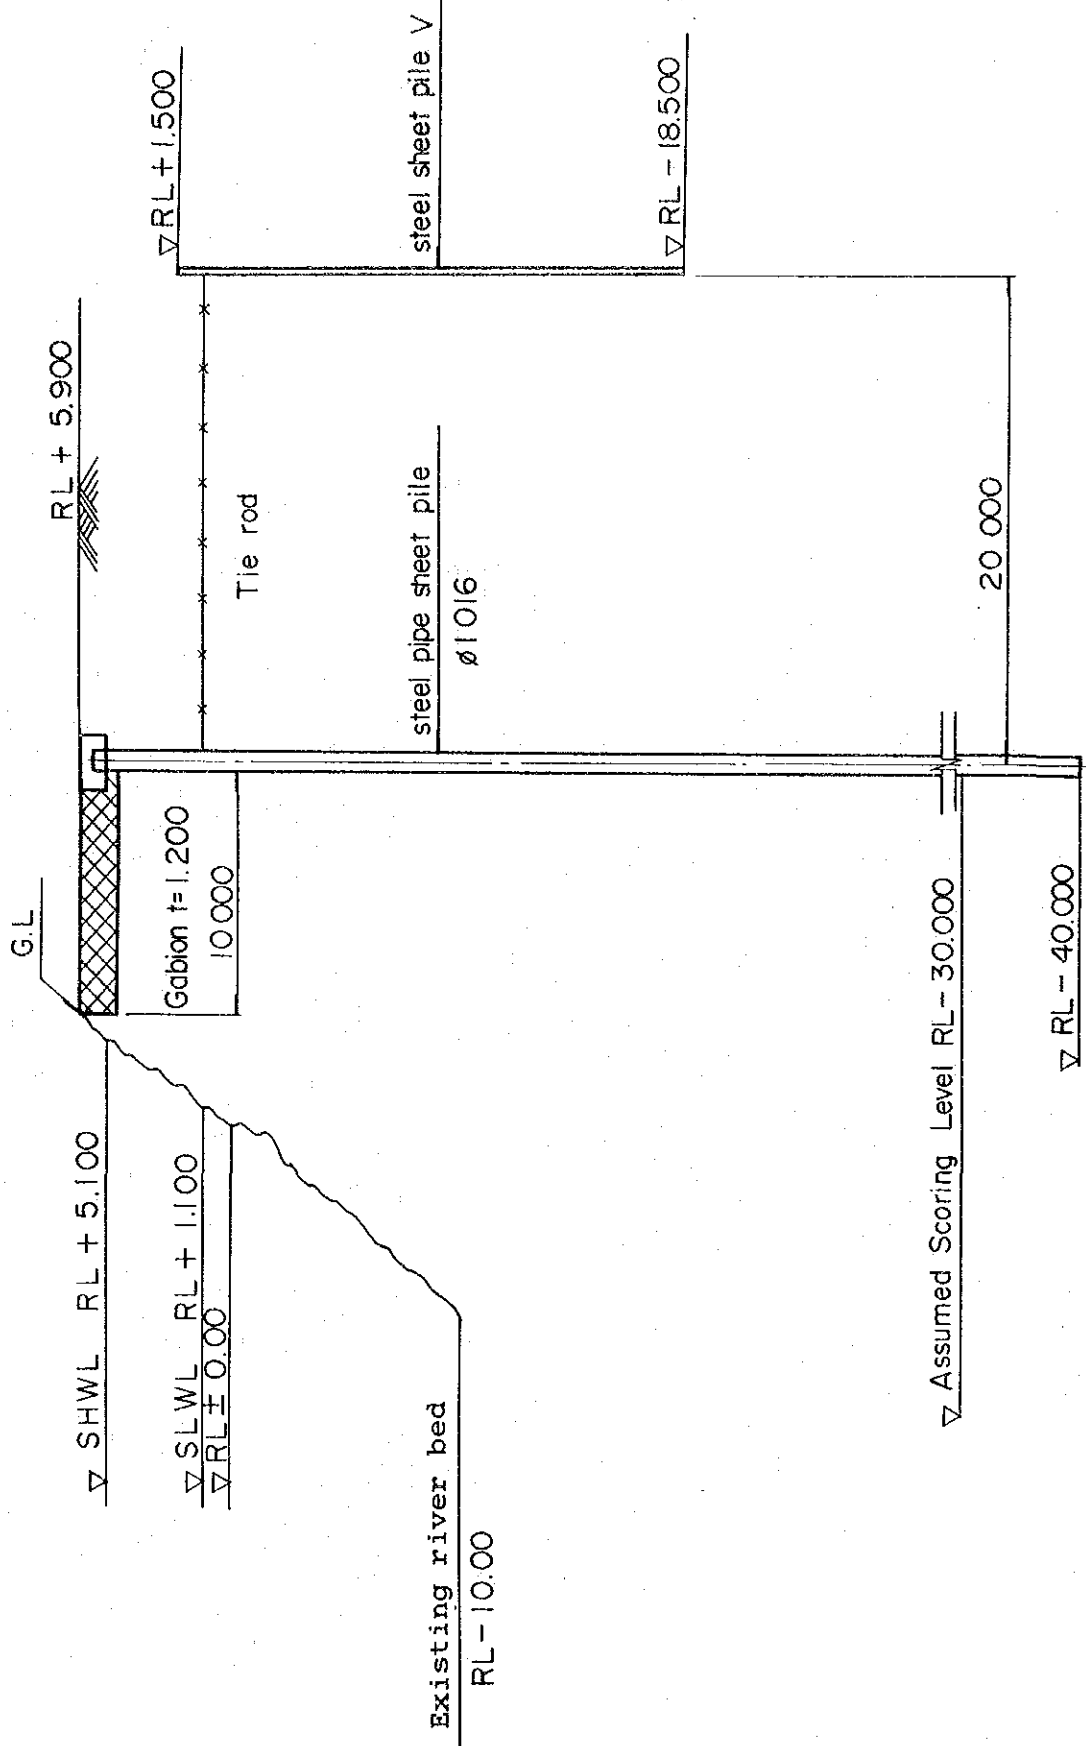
Continuous Steel pipe Piling method (TYPE 3)
